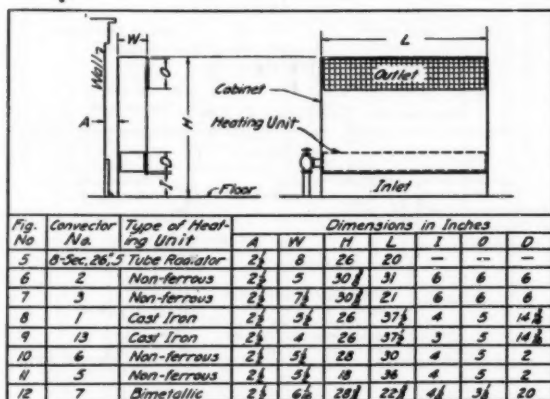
DIMENSIONS OF HEATING UNITS TESTED
